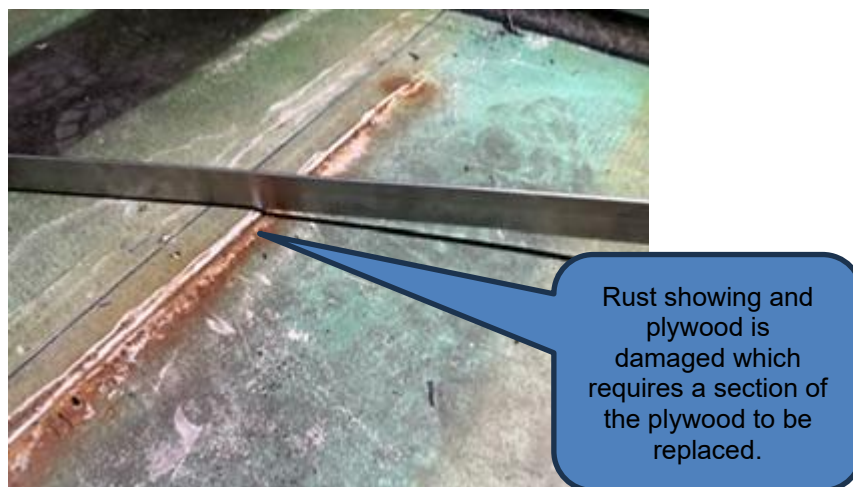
SHOWN RUST AND DAMAGED PLYWOOD – REQUIRES PLYWOOD SECTION TO BE CUT OUT.
